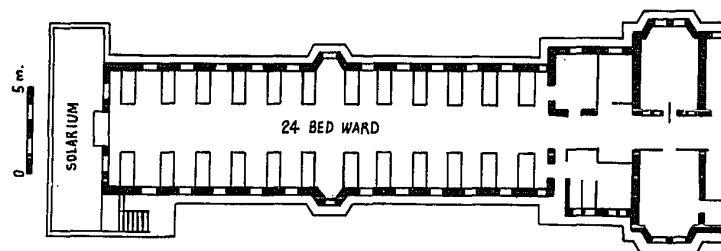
Park Hospital, London, plan of typical pavilion.
